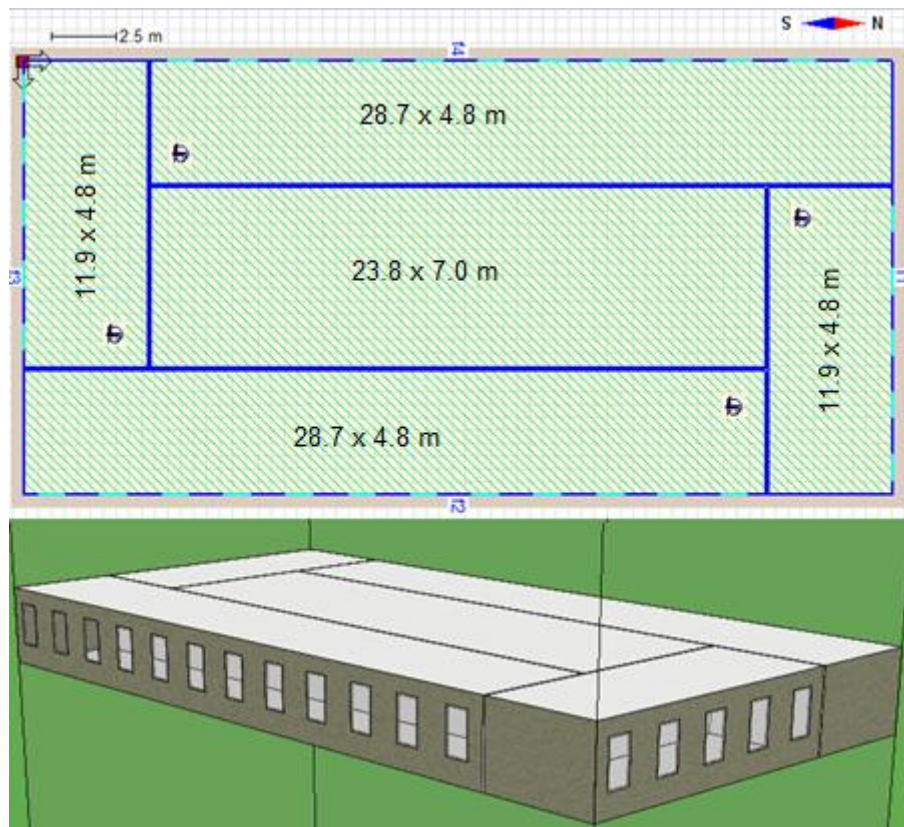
The generic model of single floor of an office building constructed with 2.4 m room module – plan and 3D view. The locations of workplaces used for control of lighting are marked in the plan.
